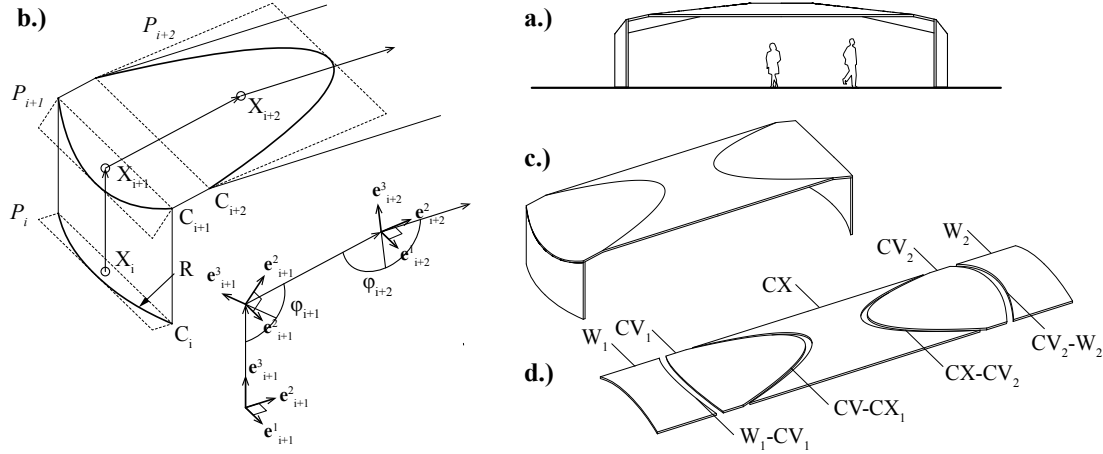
a Full-scale prototype side view schematic. b Curved-folding technique. c Curved-folded thin-shell geometry. d Unfolded CLT parts/fabrication layout
